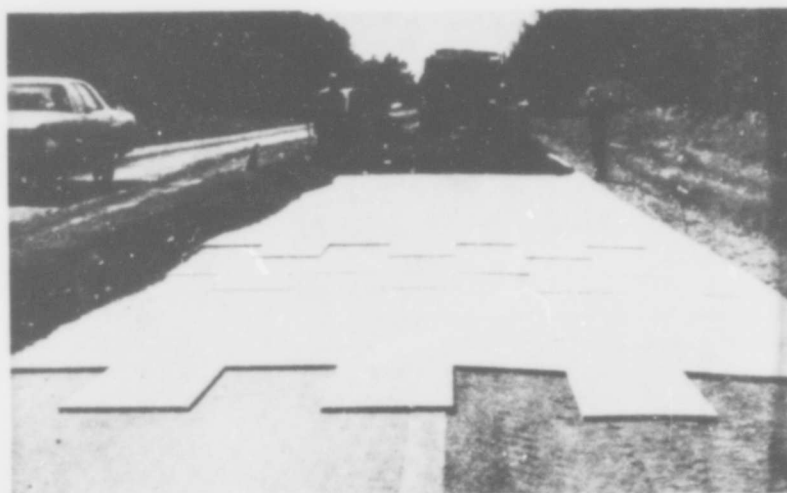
Overlaying frost-damaged pavement and shoulder with insulation and new base and pavement (204).
